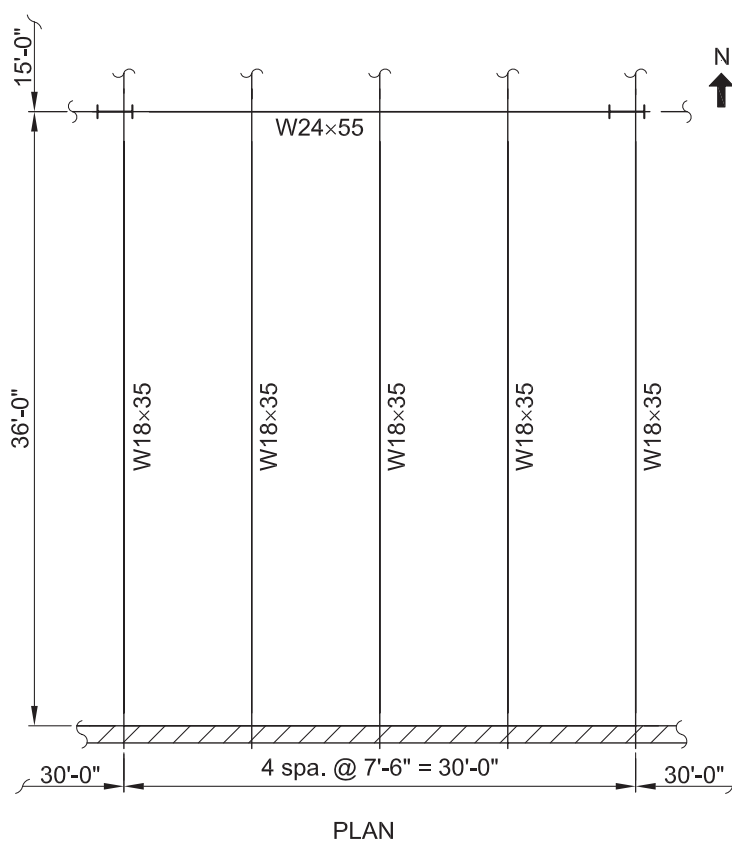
Aerobics floor structural layout for Example 5.2.
